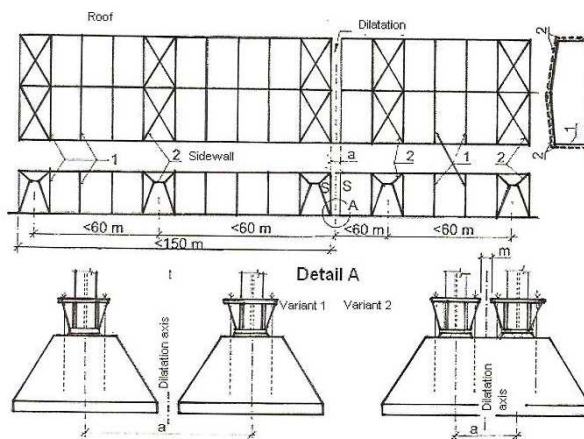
Location of dilatation: 1- frame, 2- roof and sidewall bracing
